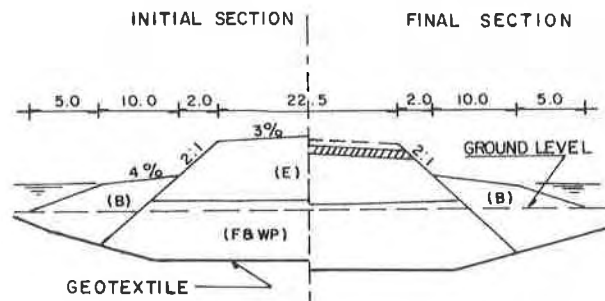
PROJECT SECTION OF THE HIGHWAY EMBANKMENT
